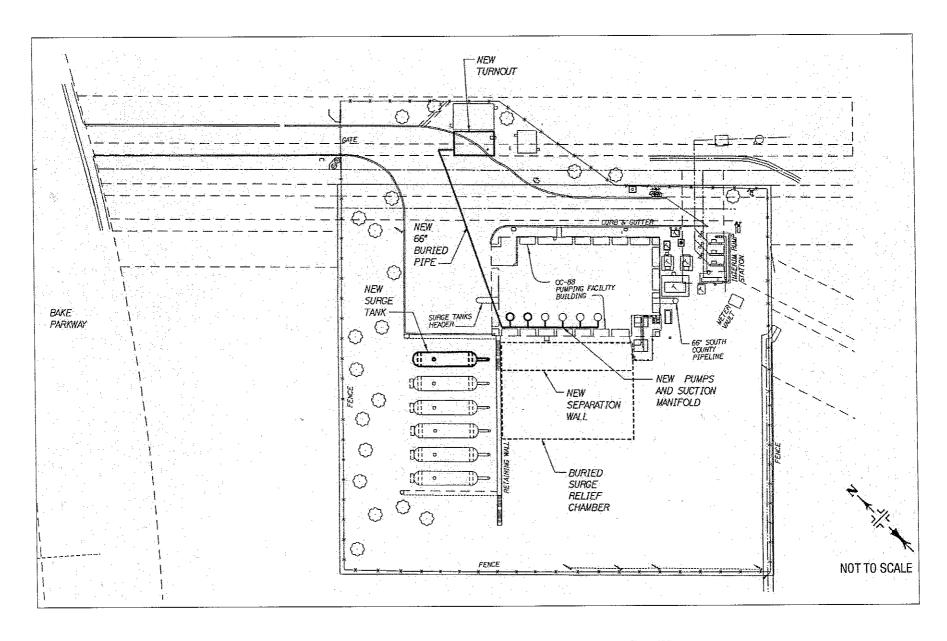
OC-88 Energy Savings Modifications - Site Plan
